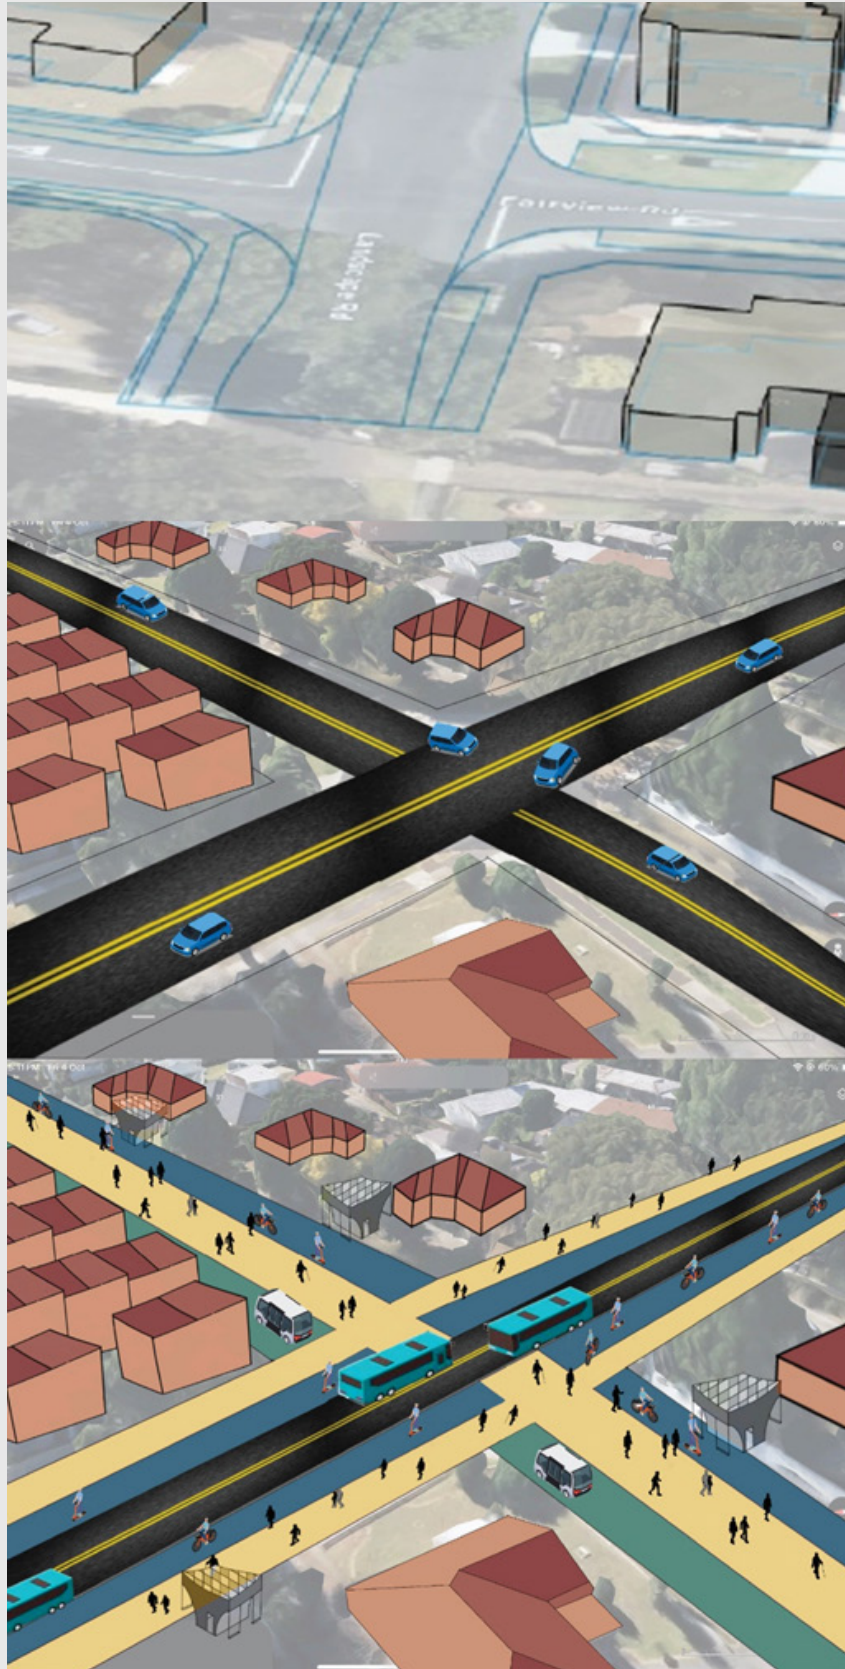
Massing CAD models and drawings showing existing layout with purposed street layout. 2024
